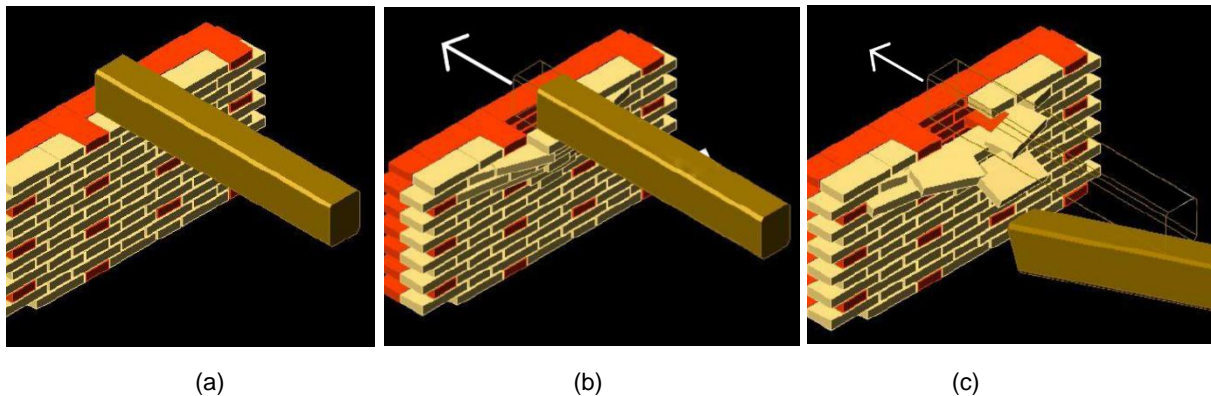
Possible failure of simply supported beams ([Manuale delle murature storiche, 2011](#)).
